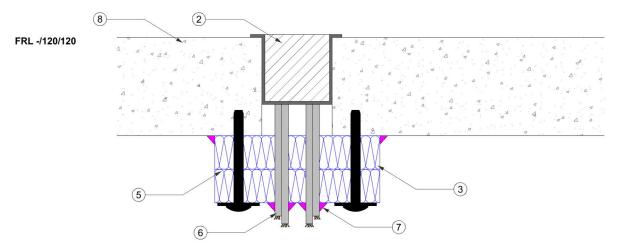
Electrical floorbox recessed in 150 mm thick concrete slab with cable bundles penetrating 2 \times 50 mm Boss® batts
